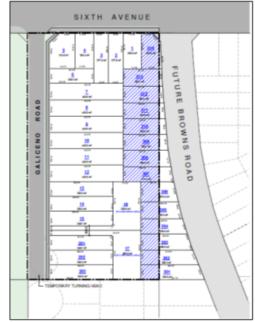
Subdivision Plan (Approved Vs Proposed) prepared by the Bathla Group
